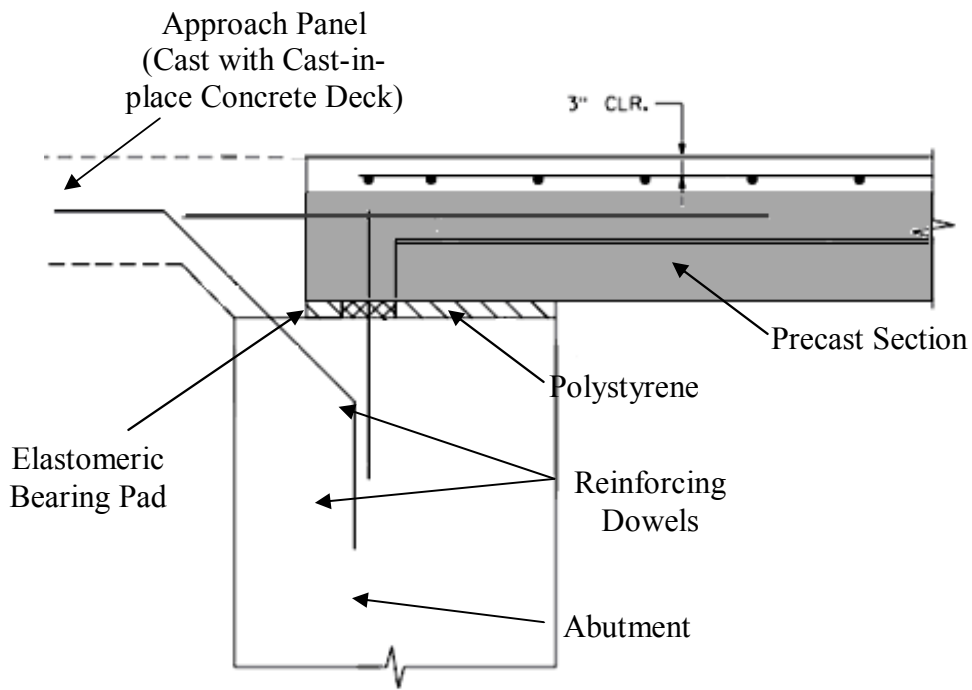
Connection detail at abutment, bridge deck, and approach panel
